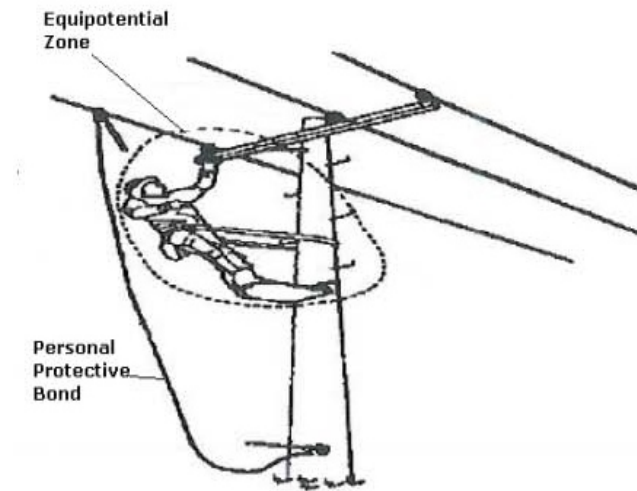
Steel or Concrete pole or structure with personal protective bond installed. Source: EE2377
